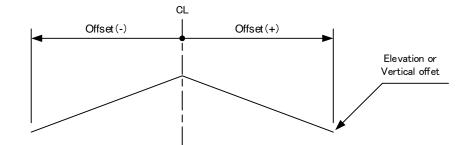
Offset and elevation or vertical offset (OffsetElevation)
